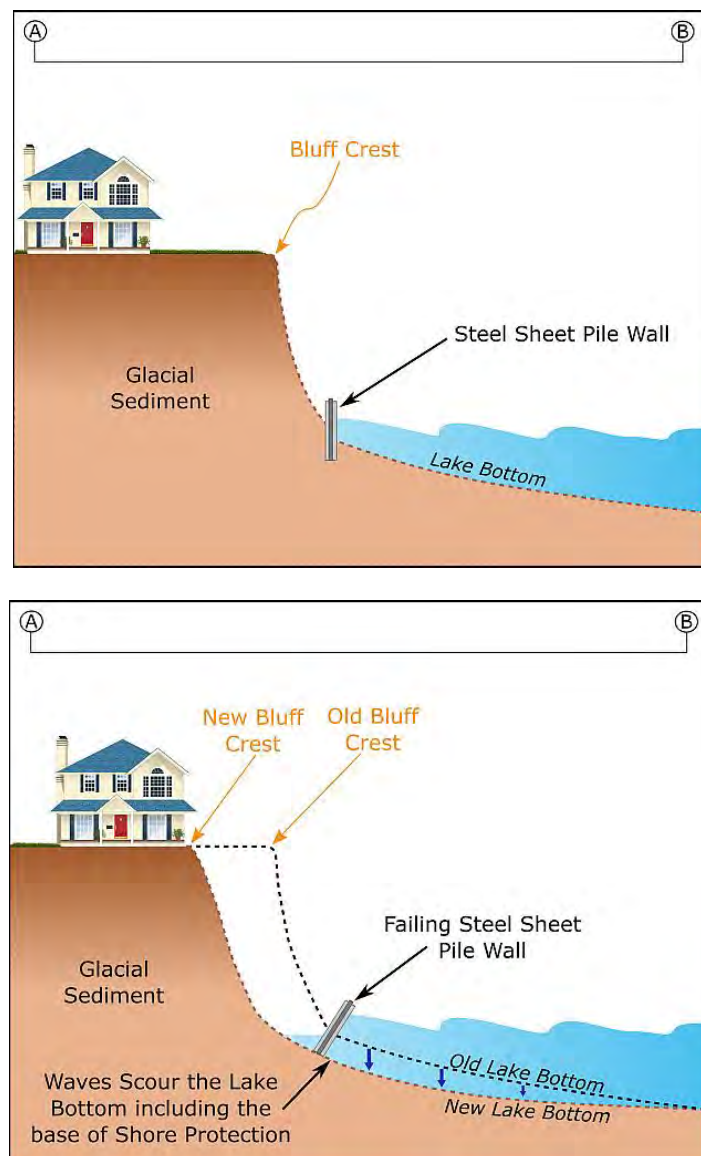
Schematic Diagram of a Vertical Wall (top) and Failure Mechanisms for Eroding Shorelines and Lakebed (bottom)
